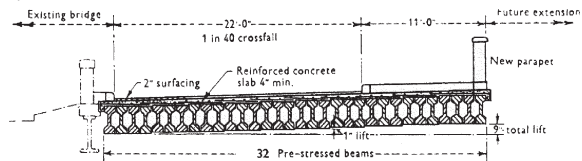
Cross section of Sinderby Bridge<sup>17</sup>
